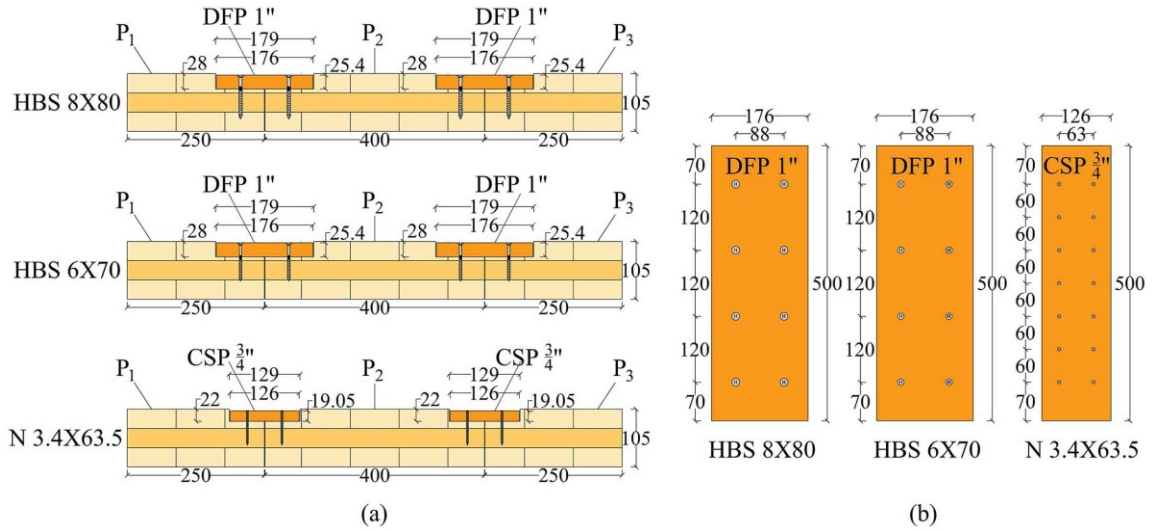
(a) top view of tested specimens; (b) spaces between fasteners and edge spacing in the plywood
